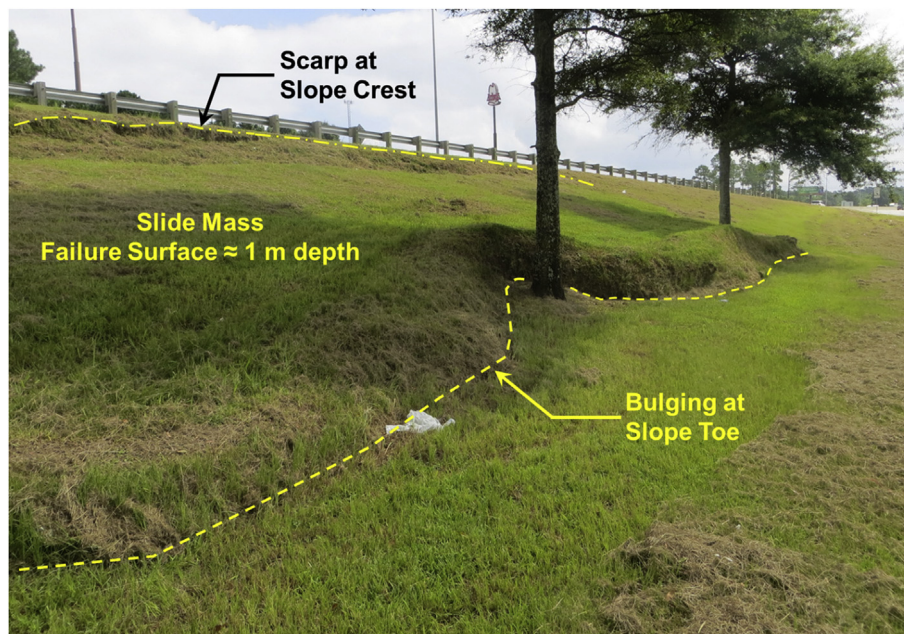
Shallow slope failure at a Louisiana highway embankment where the sliding surface is 1 m depth. The scarp or cracks at the slope crest and soil bulging at the slope toe are common characteristics of a slope failure (photo courtesy of Jack Cadigan).
